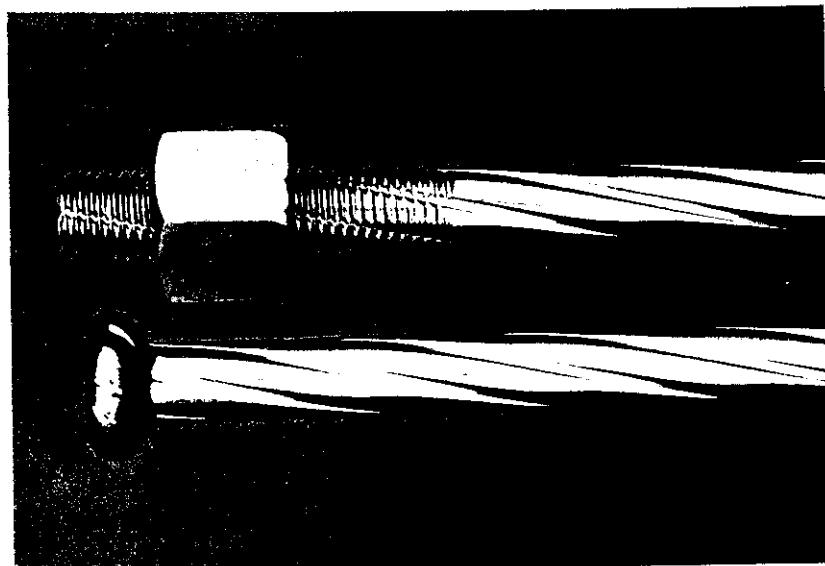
Appearance of Riverbon 9.2 mm $\phi$  (button heading and screw-threading)
